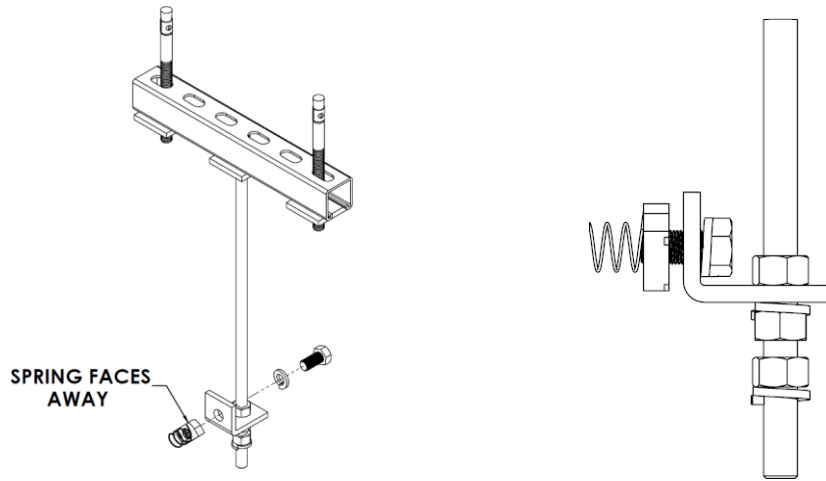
Strut Channel Nut Threaded with Spring Facing Away
